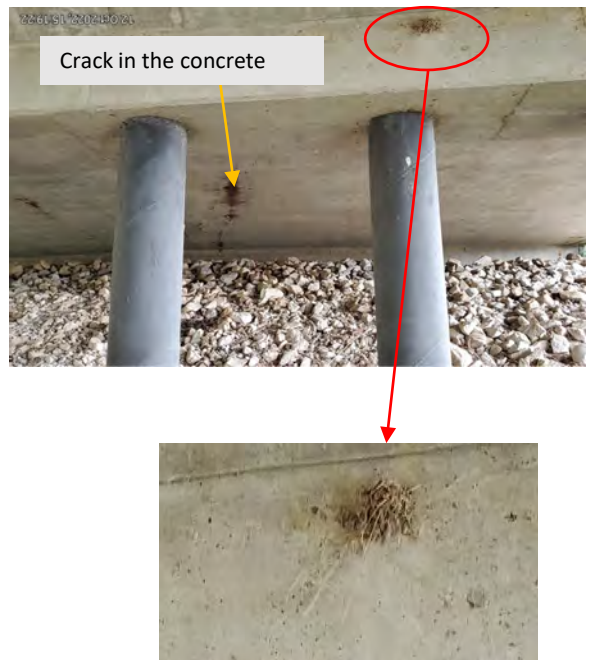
Looking east at the east slab from the west side of the bridge. There was what appears to be an Eastern phoebe nest on the face of the slab.
